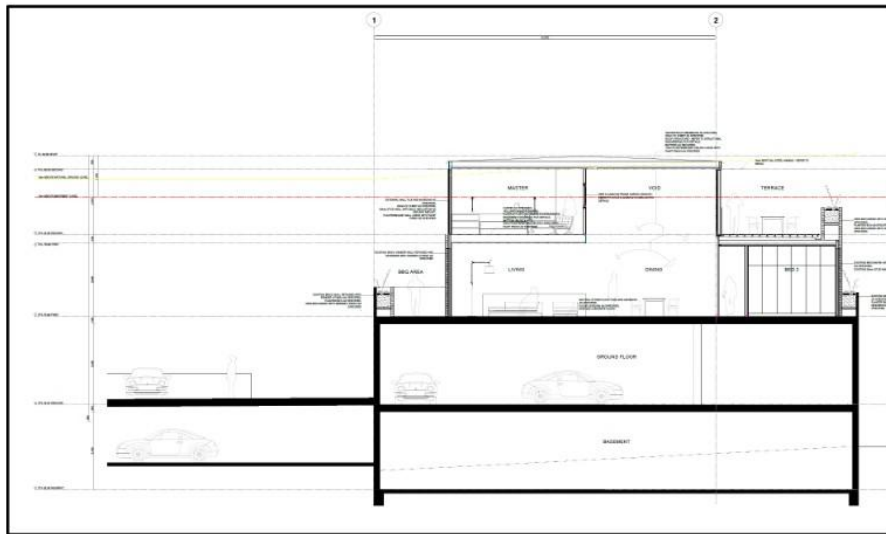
Excerpt of section A, noting the 12m maximum building height line is approximately in the middle of the second floor addition
